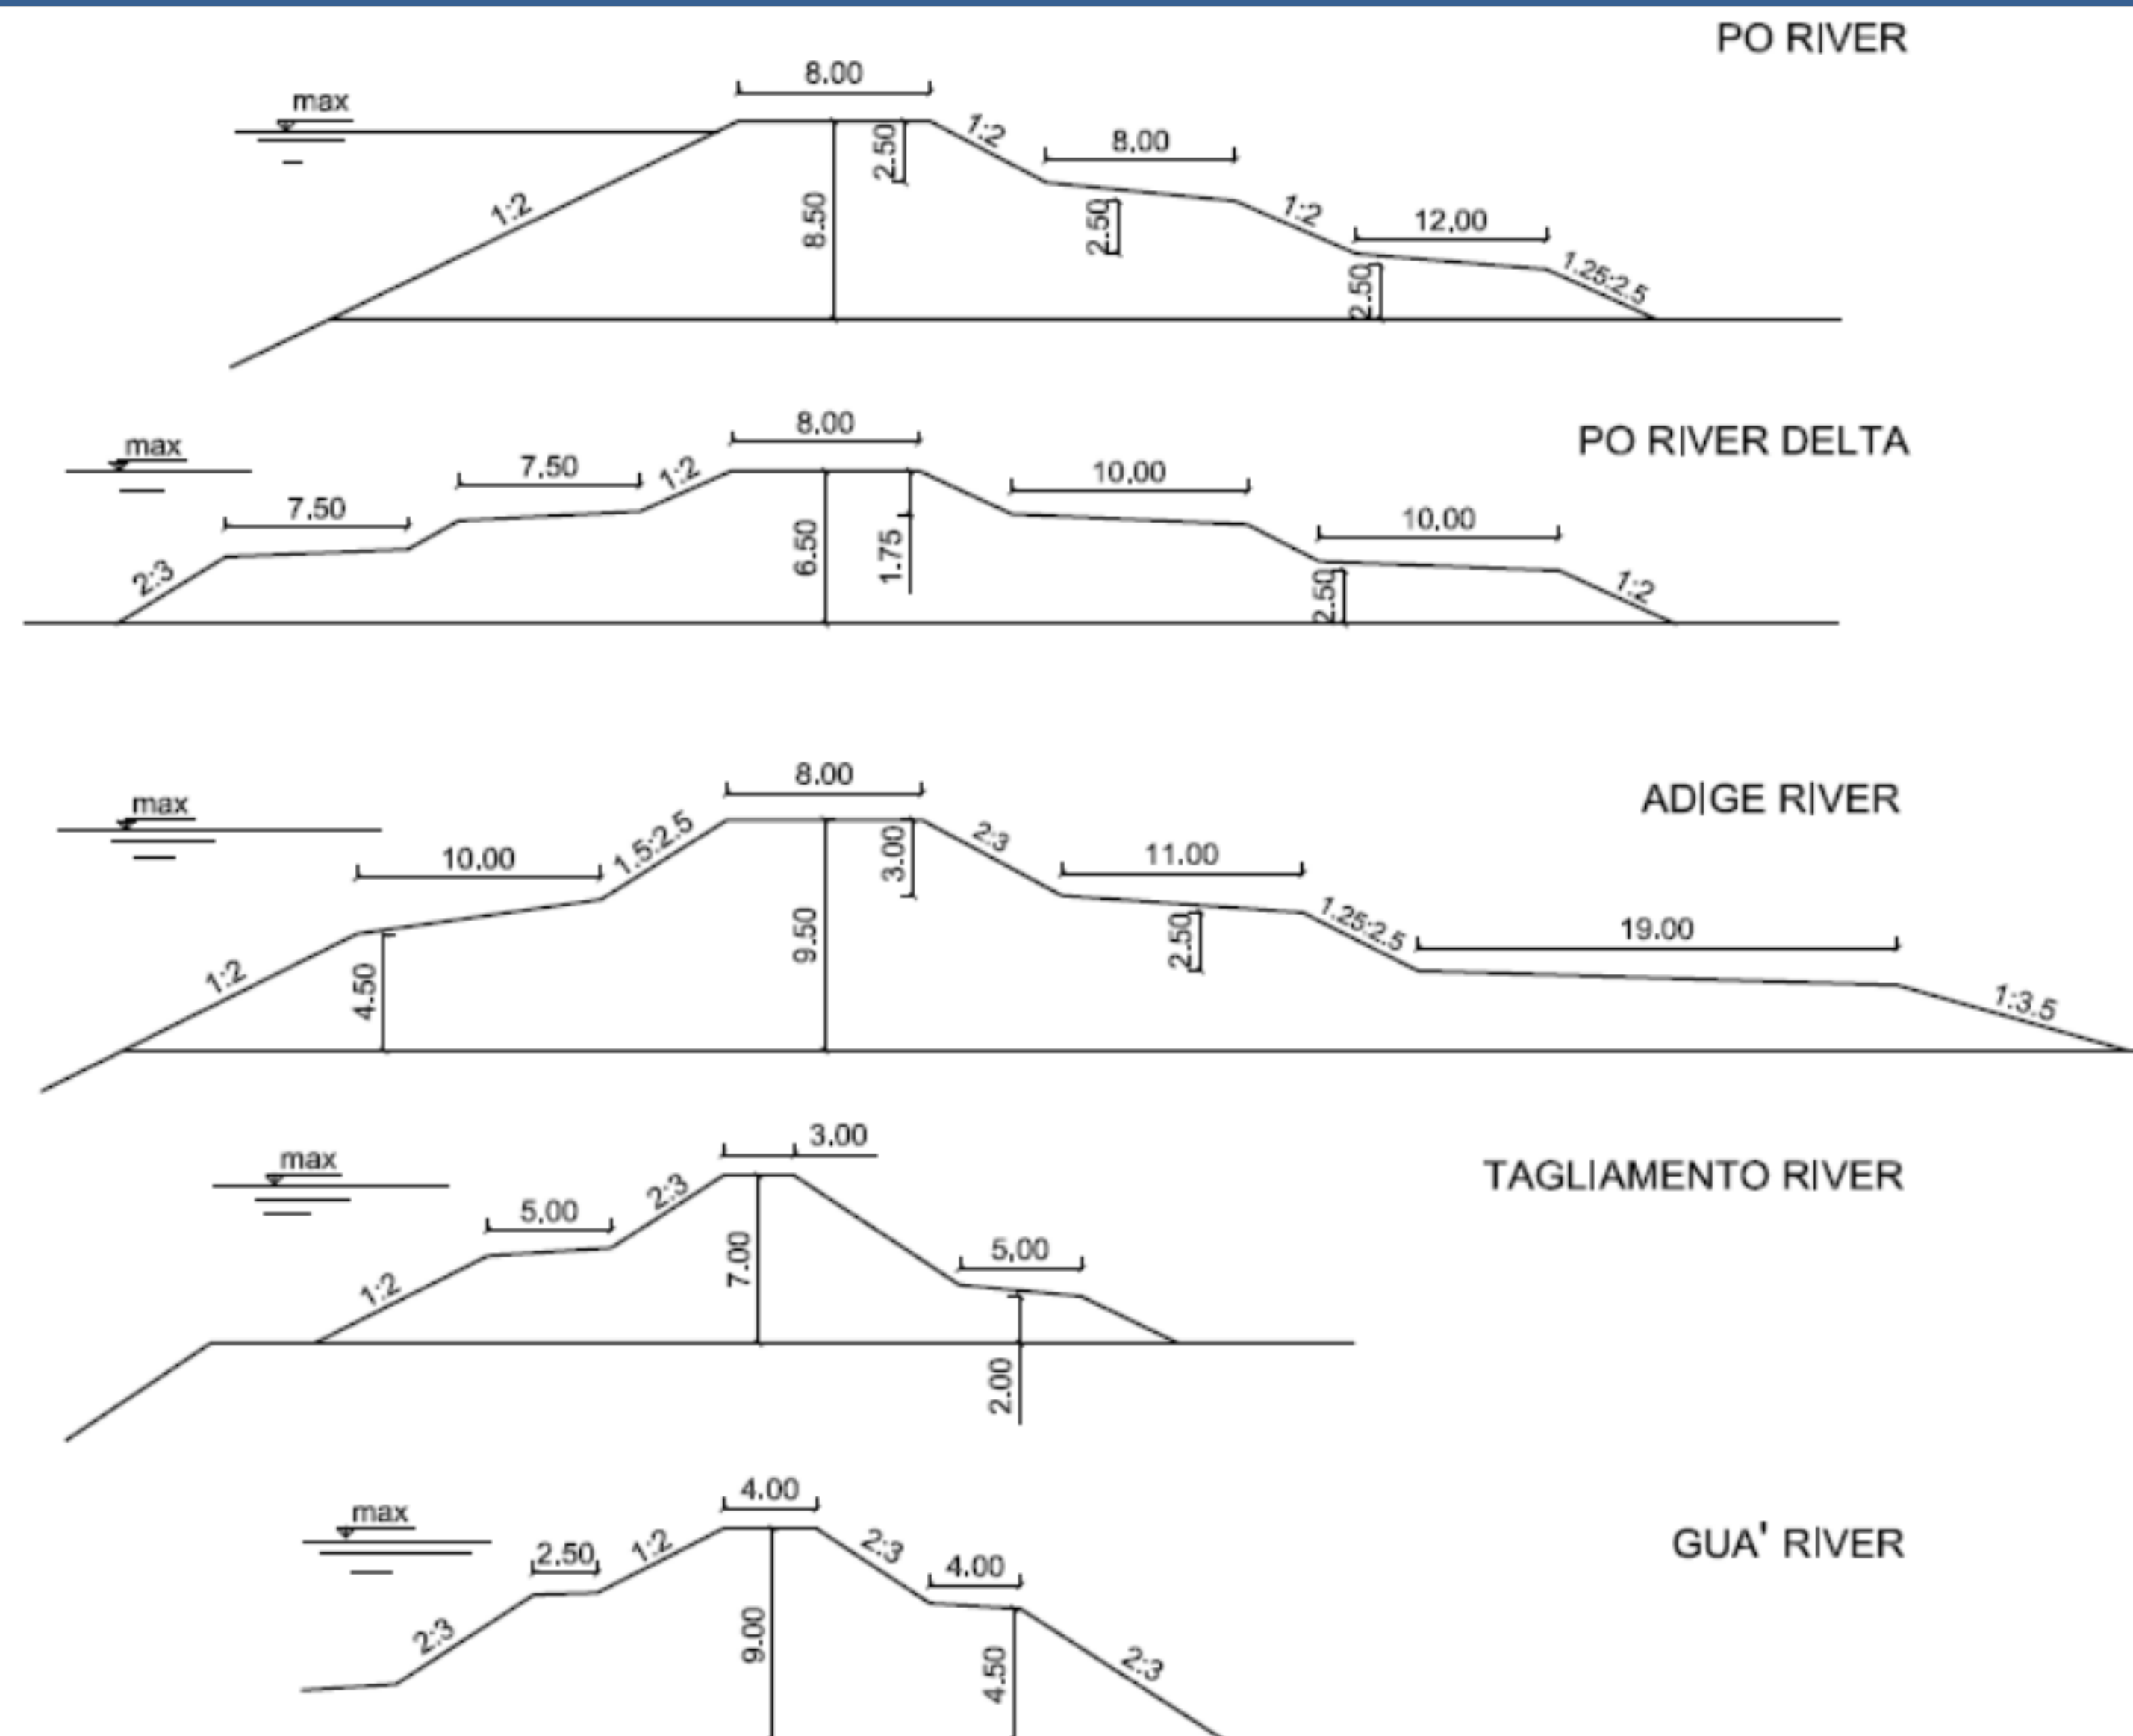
Typical embankment cross-sections of rivers in Northern Italy.
